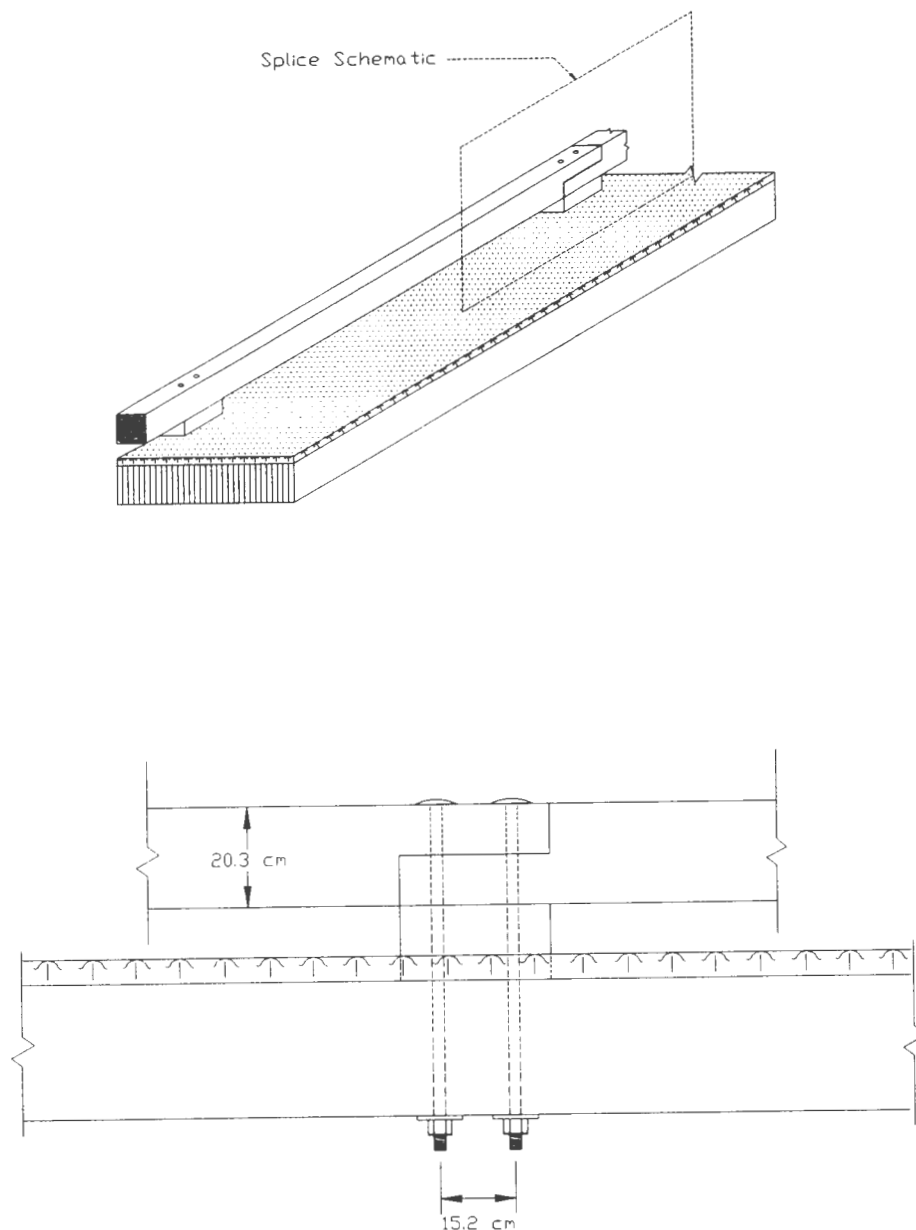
Typical curb section mounted to deck surface and curb railing splice.
